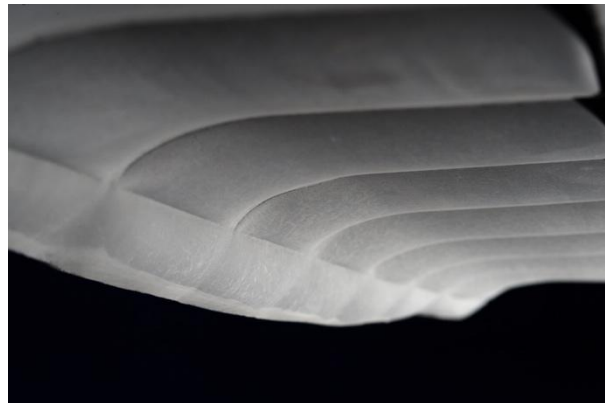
Fabric formed concrete beam (photo courtesy J Orr)
